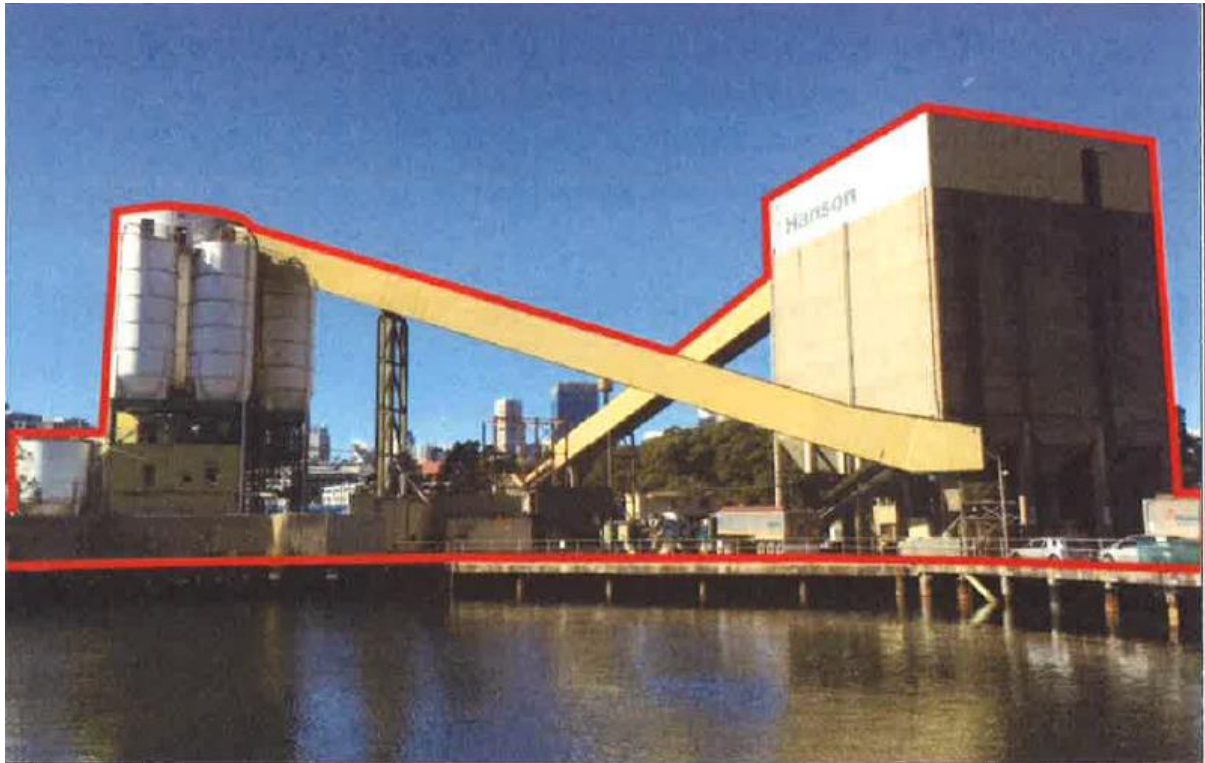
| Approved demolition of the concrete batching plant (outlined in red) (source: DA 9449 EIS)
